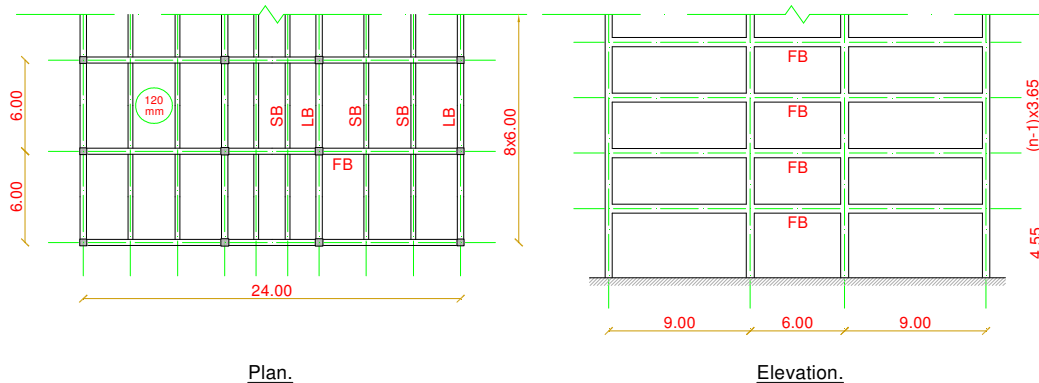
Generic plan and elevation of the buildings (all dimensions are in meters unless otherwise mentioned).
